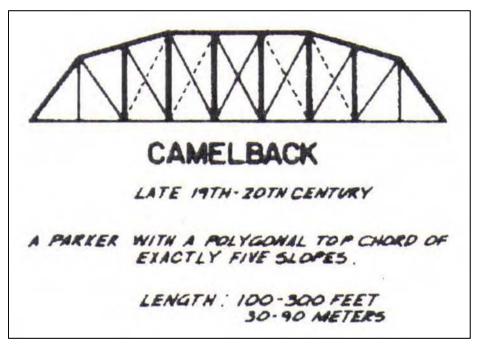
SKETCH OF A THROUGH CAMELBACK TRUSS BRIDGE (NCDOT 2013)
